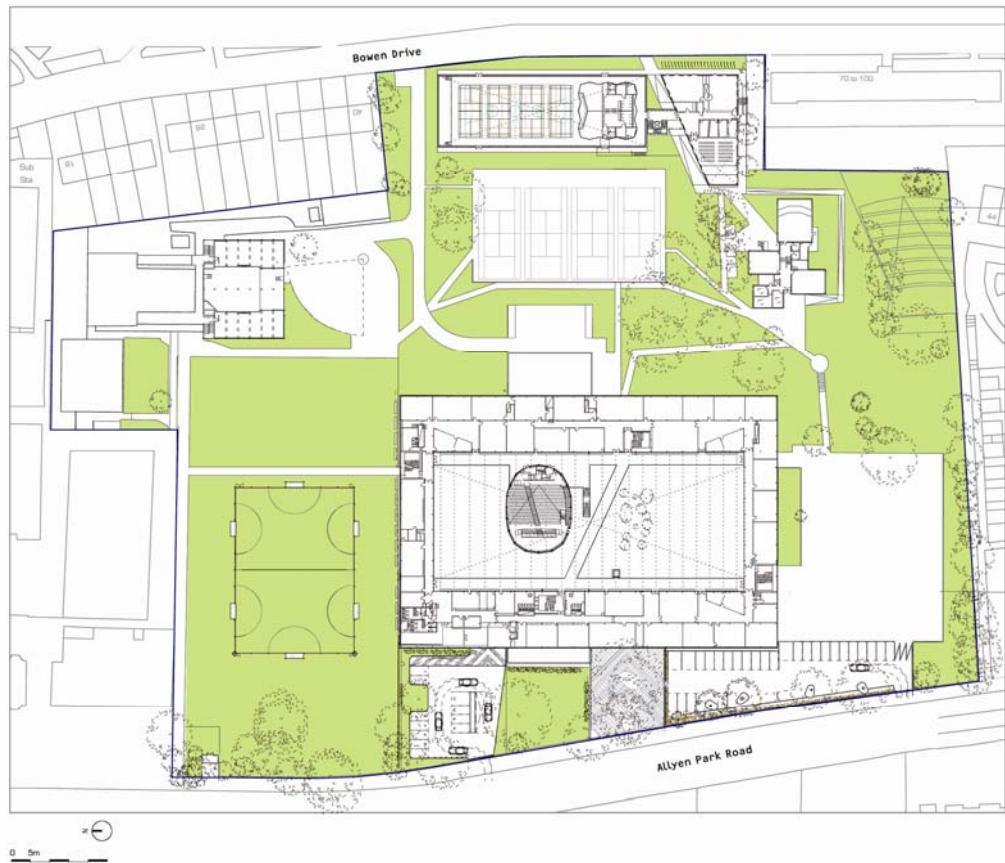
; Kingsdale School, site plan showing music and sports facilities at top; Image: dRMM
